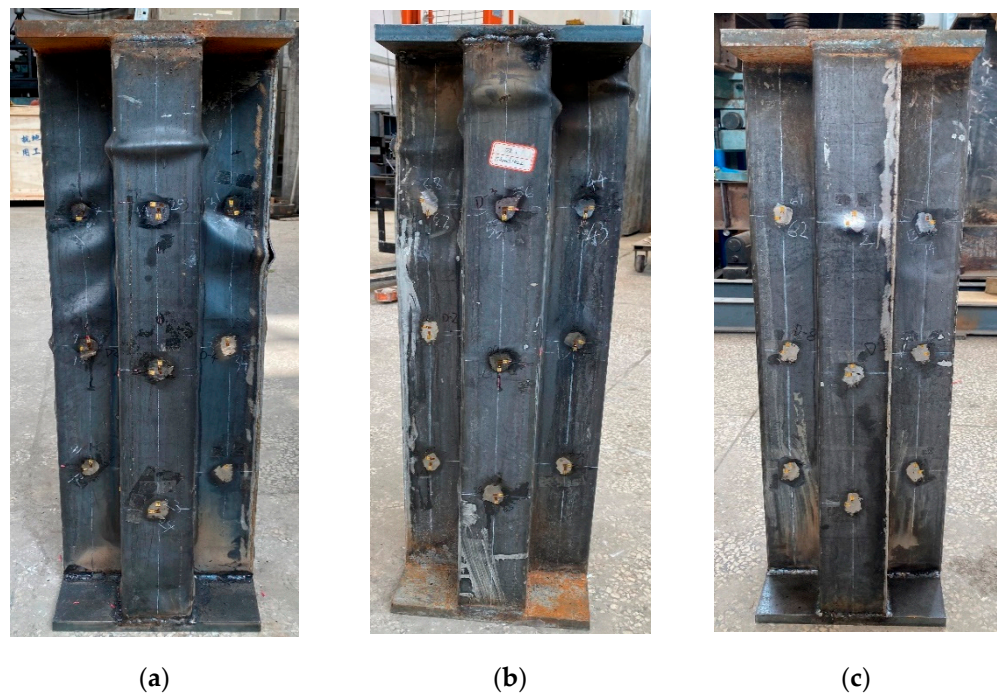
Cross-shaped CFST specimen's failure modes: (a) MC-CFST specimen; (b) SC-CFST specimen; (c) OC-CFST specimen.
